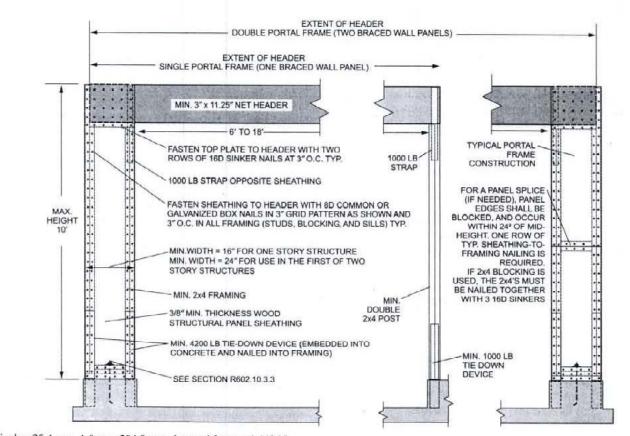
ALTERNATE BRACED WALL PANEL
